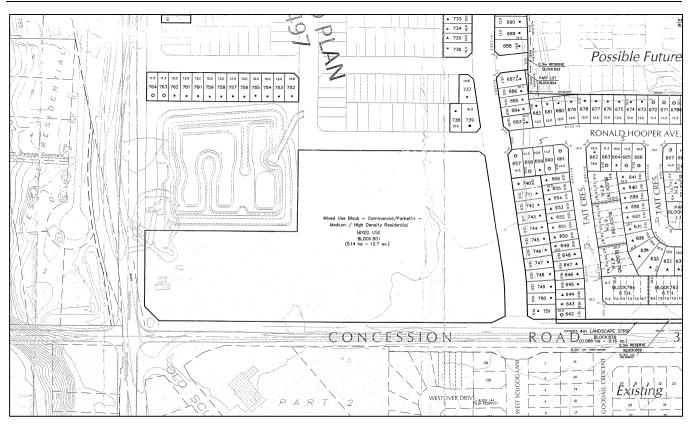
Latest Draft Approved Plan of Subdivision showing Block 801
